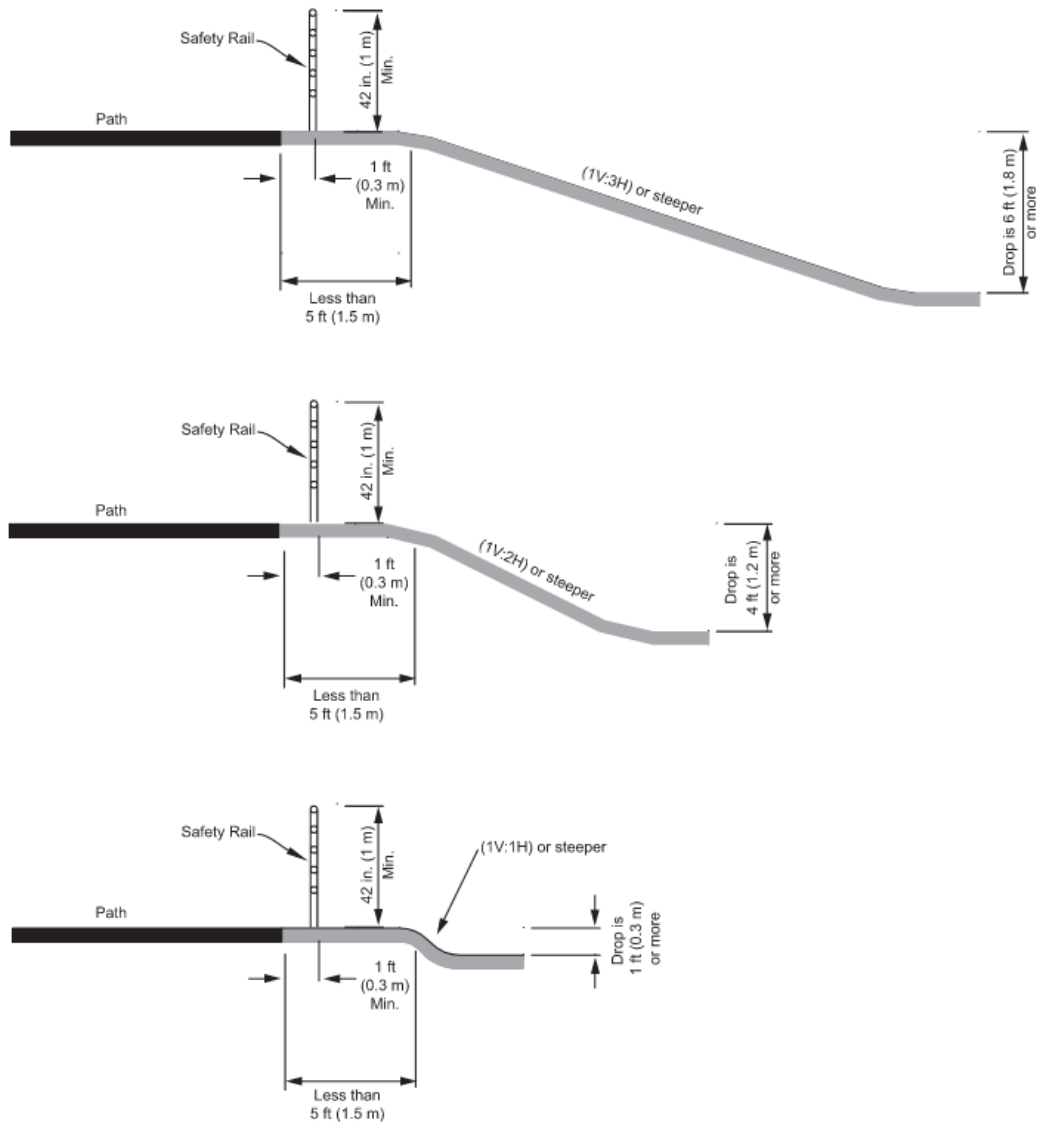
Bikeway Barrier Between Path and Adjacent Slope (AASHTO)
